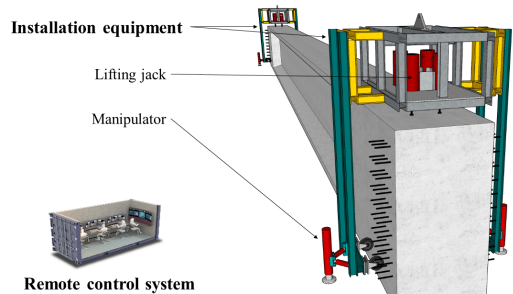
Composition of Remote Precise Installation System for Bridge Girder [13]
